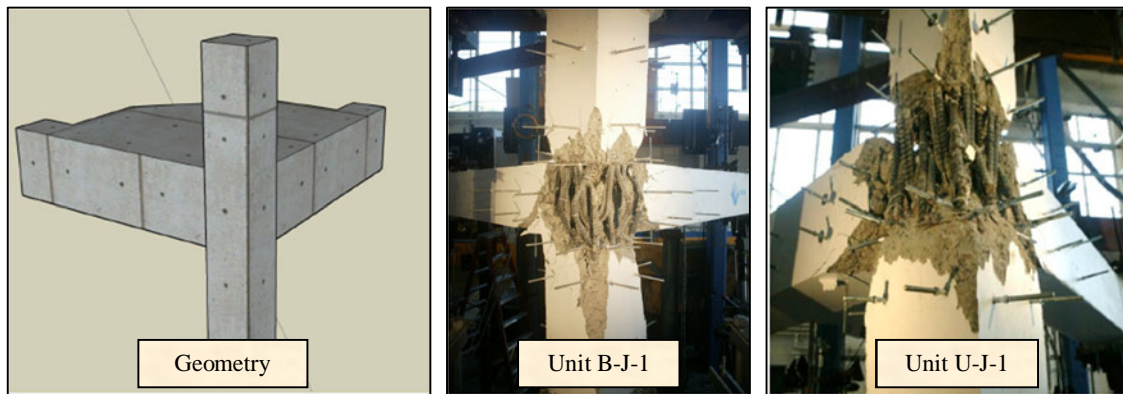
Specimen isometric geometry of test specimens and failure modes of some specimens (Hassan, 2011)
